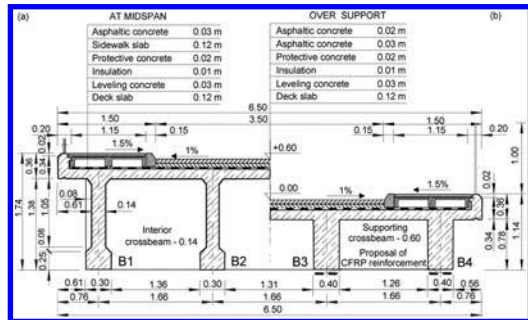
Cross-sections of post-tensioned concrete span at: (a) midspan (before repair), (b) support (after its renovation).
